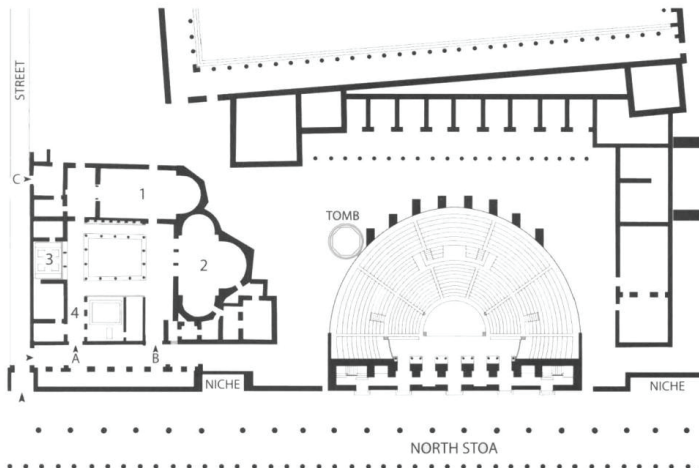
Plan of Bishop's Palace on the left: A, southwest doorway; B, south east doorway; C, northwest doorway; 1 north apsidal hall; 2 triconch room; 3 exedra-like space with mosaic floor; 4 southwest entrance corridor.
